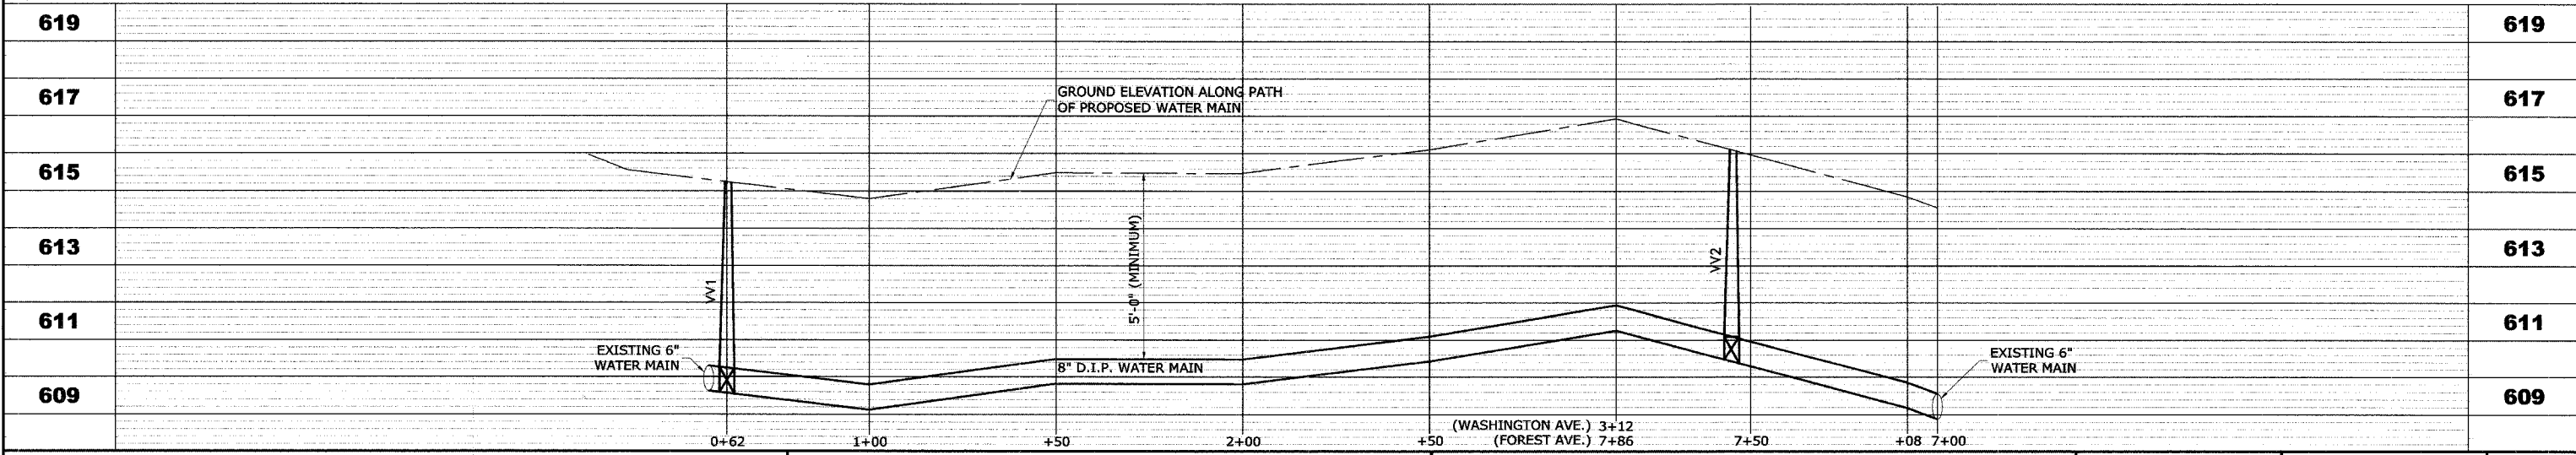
DETAIL OF CONNECTION TO EXISTING WATER MAIN ON PRAIRIE AVENUE
